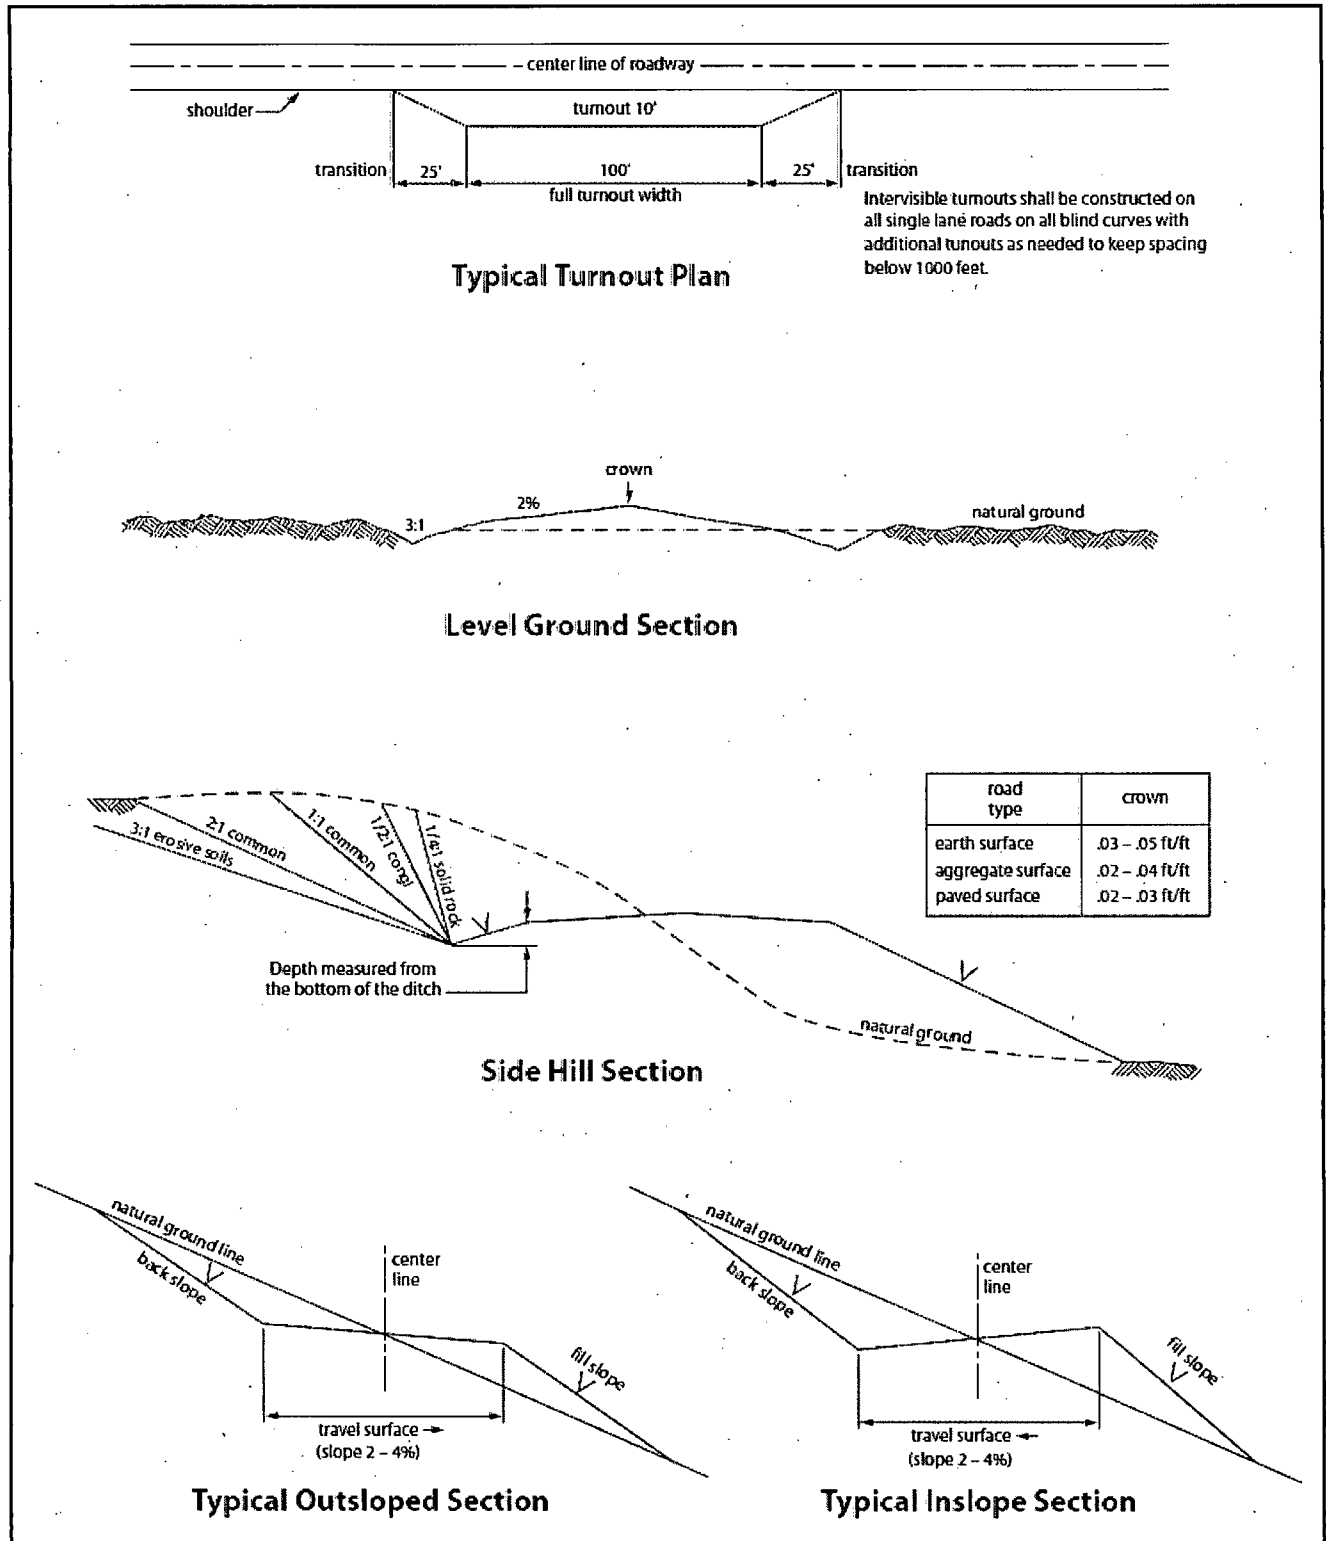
Cross-sections and plans for typical road sections representative of BLM resource or FS local and higher-class roads.
